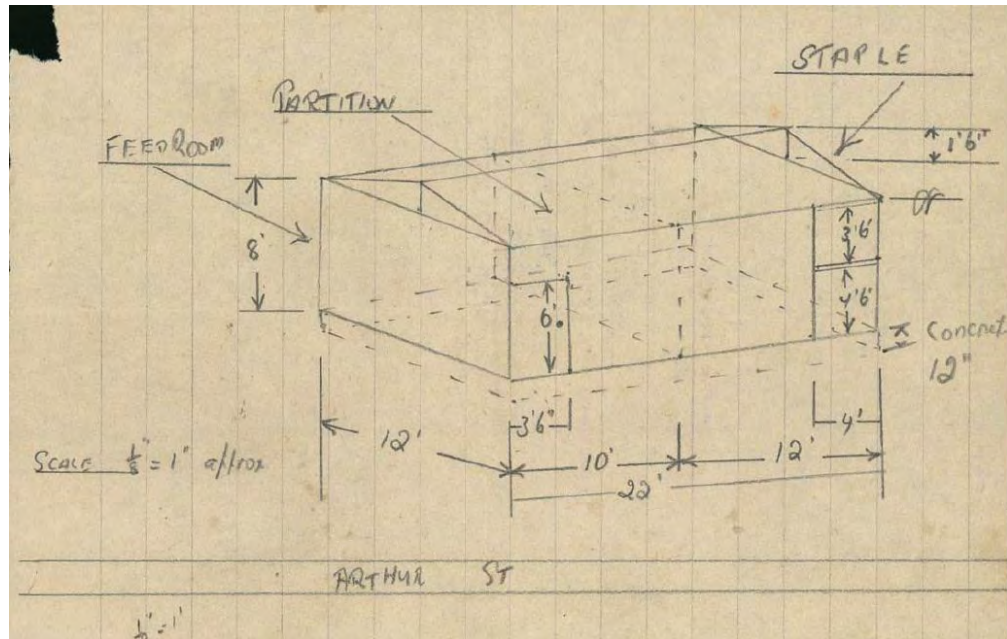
Plan of proposed stable and feed shed, 1971. (Source: City of Grafton, BA71/85)
